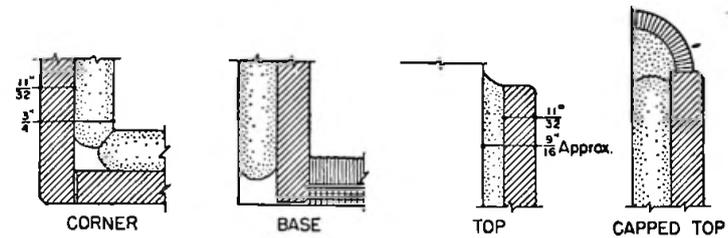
INSTALLATION DETAILS OF STRUCTURAL GLASS
